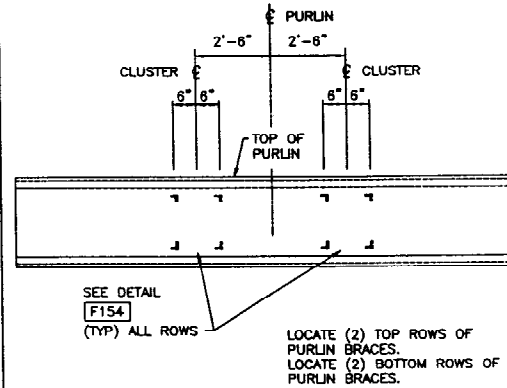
PURLIN CONNECTION TO EW ROOF BEAM
